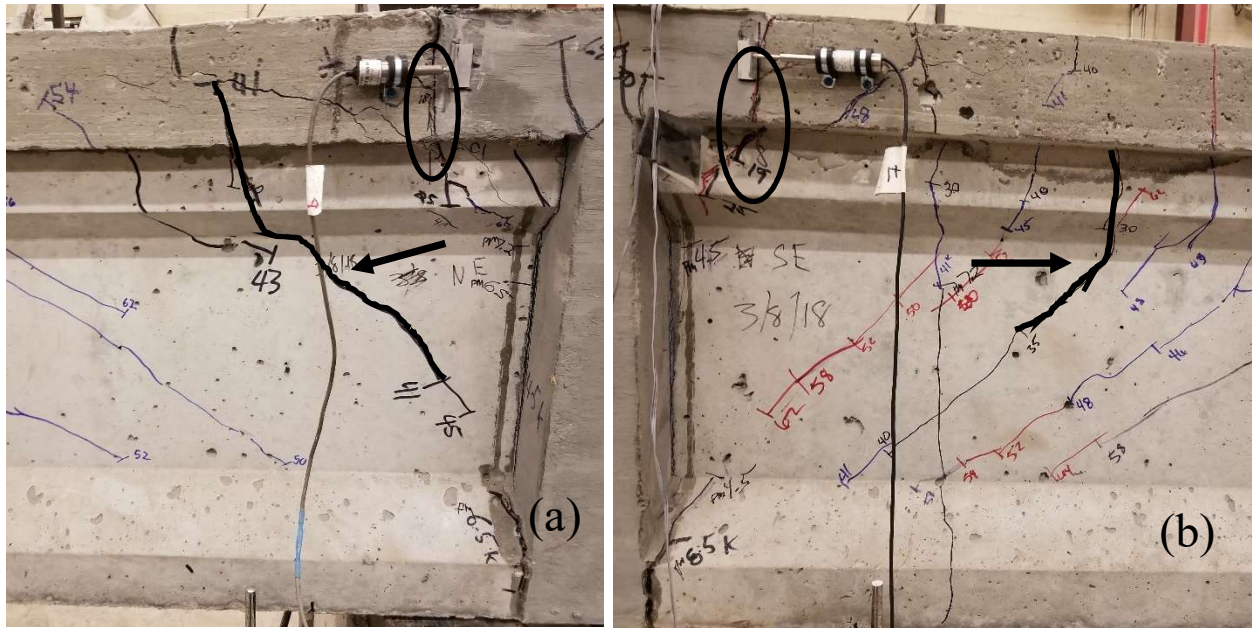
Initial flexural cracking under the load point on the NC3-N girder at 41 kips of load (a) and initial flexural cracking under the load point on the NC3-S girder at 46 kips of load (b). Arrows point to the dark lines that indicate the initial flexural cracks.
